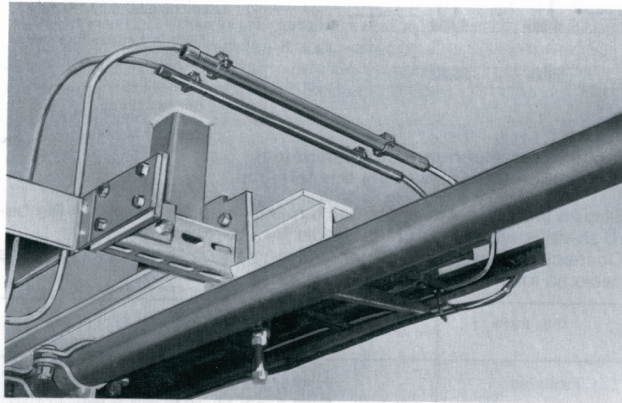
Mechanical protection of the bus cable through protection mounting
